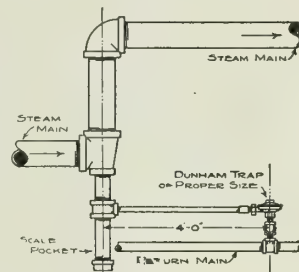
METHOD OF DRIP-ING RISE IN STEAM MAIN, DUNHAM VACUUM SYSTEM
